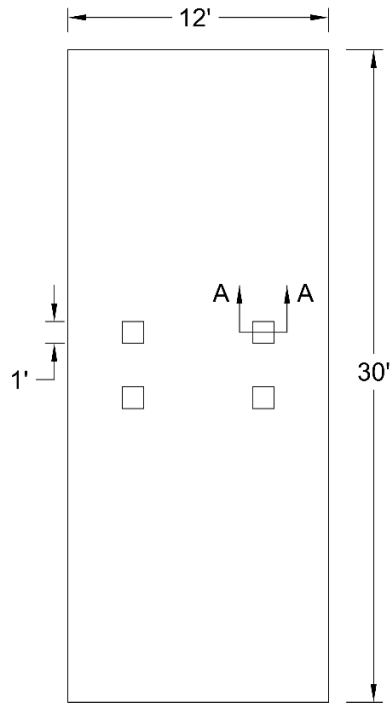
Panel layout of SWP example analyzed with solid sections at floor connections
